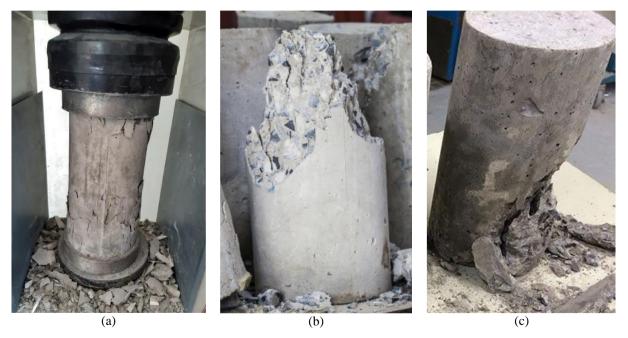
(a) type 3 fracture; (b) type 2 fracture; (c) type 5 fracture
